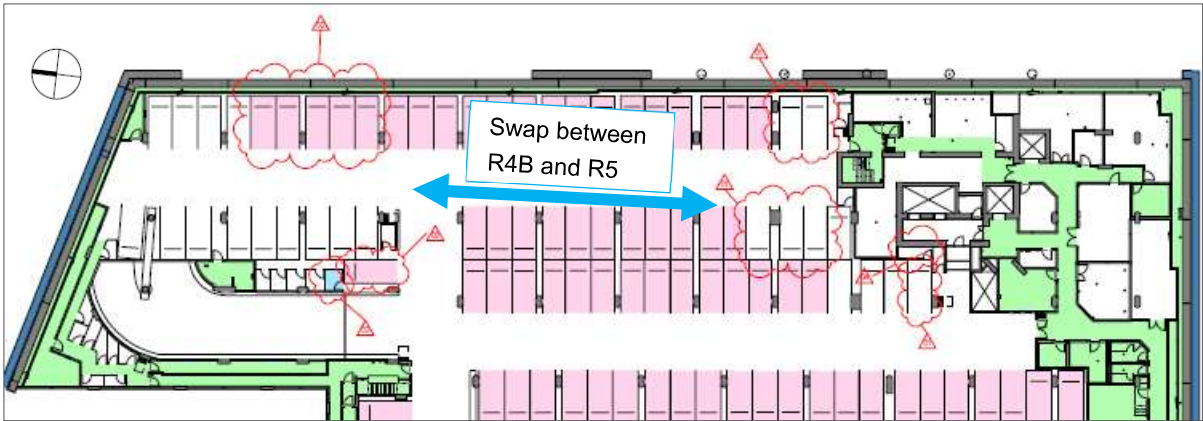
| Proposed plan of Level B1, with clouded pink/blue spaces reallocated to Building R4B, and clouded white spaces reallocated to Building R5
